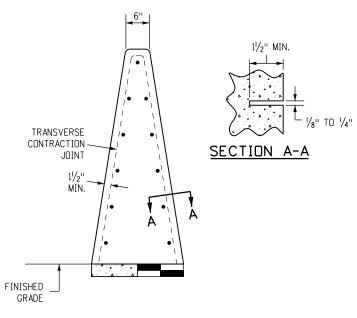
DETAILS SIMILAR TO STYLE CE EXCEPT AS NOTED. USE CONCRETE BARRIER END ANCHOR WHEN NECESSARY. SHOWN WITH A 36 INCH ROADBED SURFACES OFFSET. BARRIER FOR OFFSET ROADWAYS.
